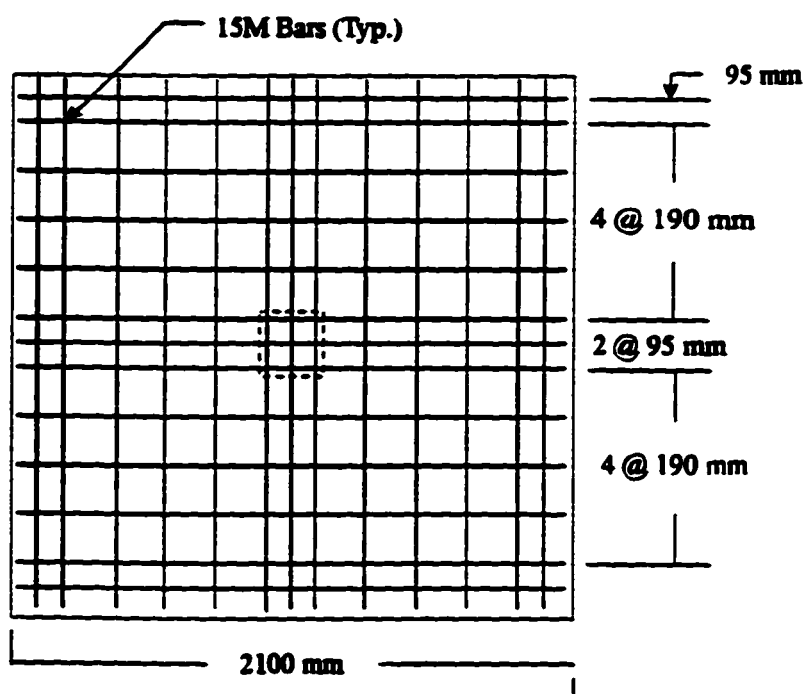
Top Mat Reinforcement Layout for Specimen #5-4C
